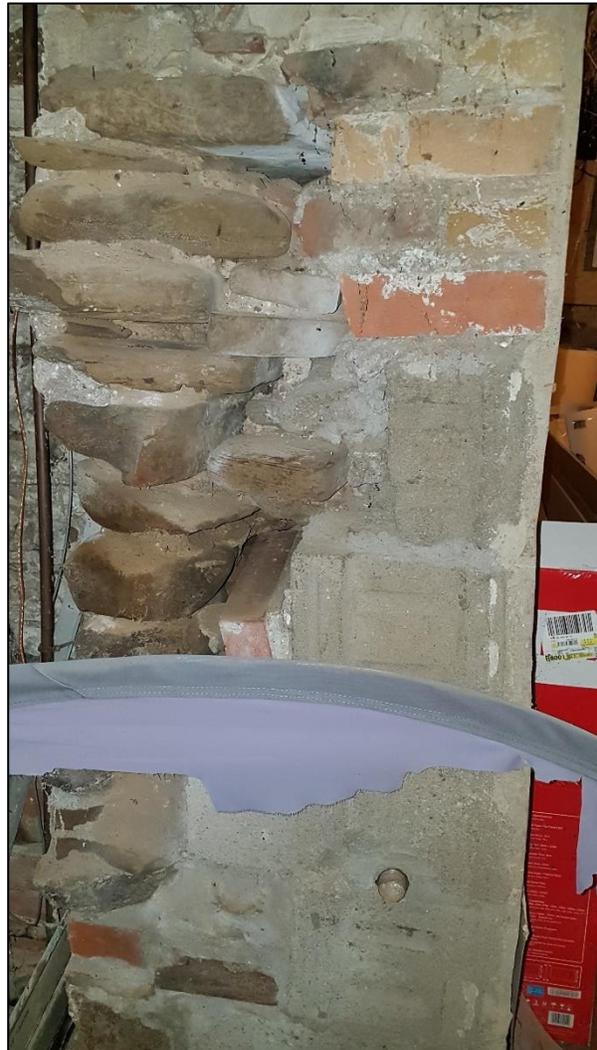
Portion of the foundation wall where the original stone foundation meets the concrete block foundation of the rear addition (note that portions have been repaired with brick)
